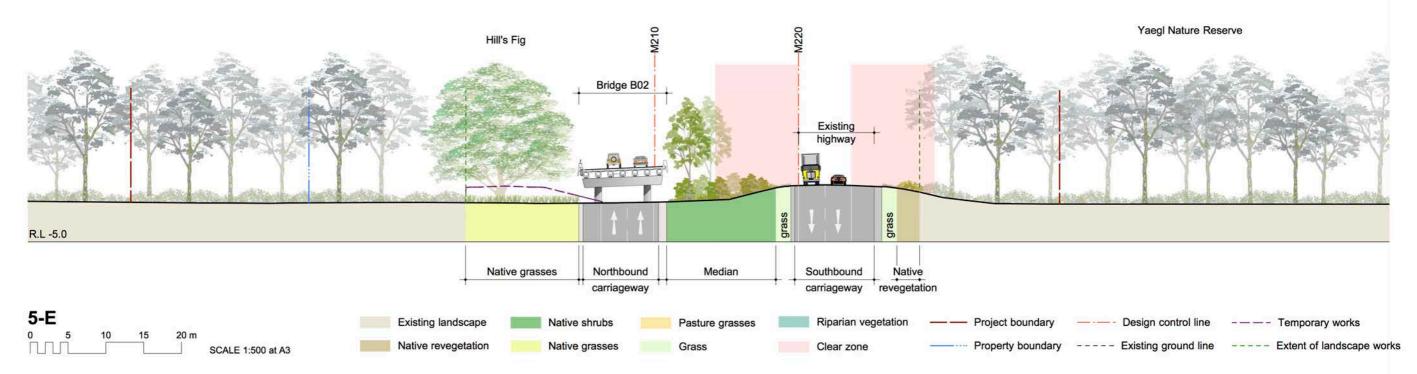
Section 5-E at Bridge B02 – Northbound Bridge over Clarence Floodplain
